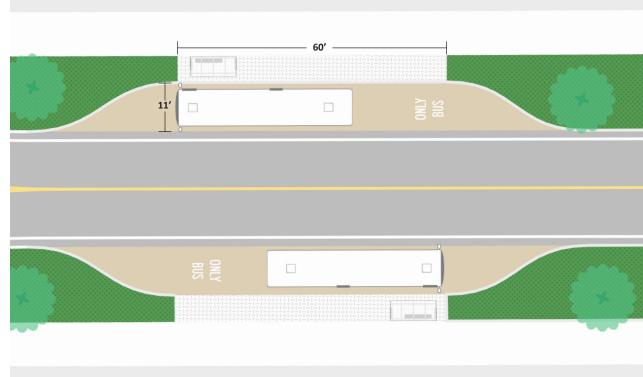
Typical Cross Section with Bus Pull Out Bay in Segment 2
